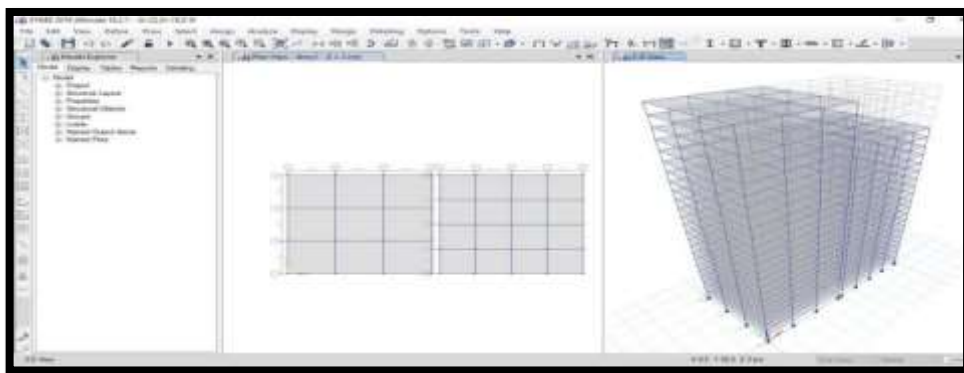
Plan and 3D view of (G+22)(G+18) buildings without shear wall case
